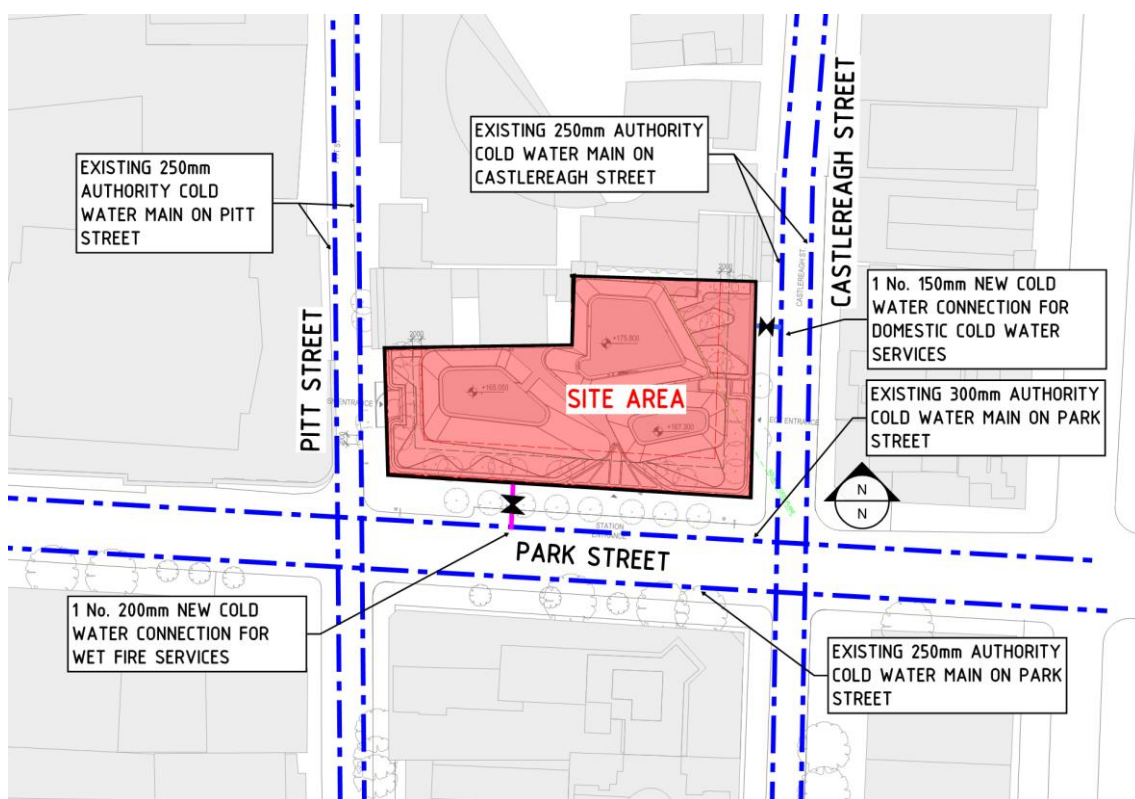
Site Cold Water Connection (from Sydney Water asset maps)
